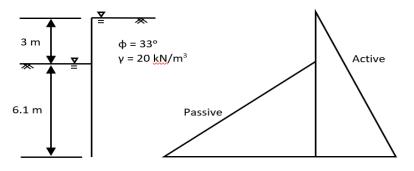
Cross-section of embedded retaining wall with lateral earth pressure diagram.
